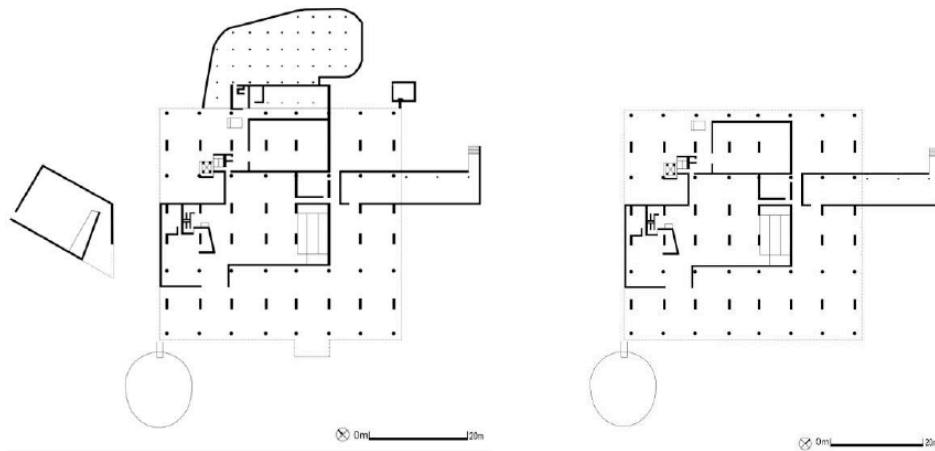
Ground floor plan (left) and first floor plan (right) of the Museum and Art Gallery in Chandigarh. (redrawn by the authors).
